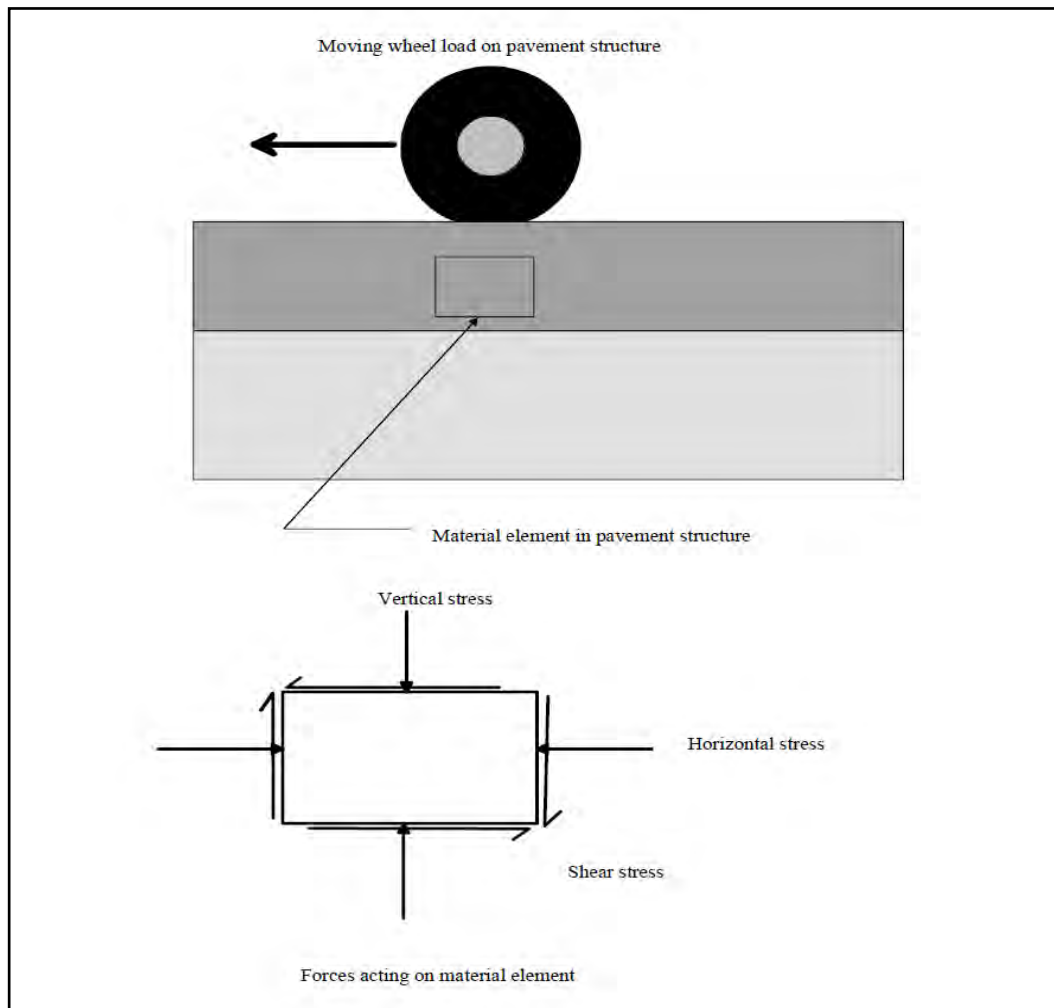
Stress action on the asphalt pavement (Garba 2002)
